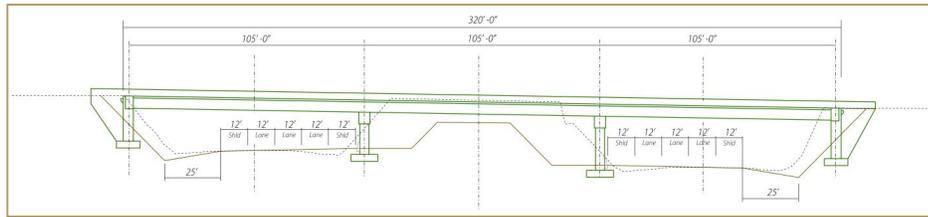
Fourth Street Bridge replacement typical section (from I-40)
